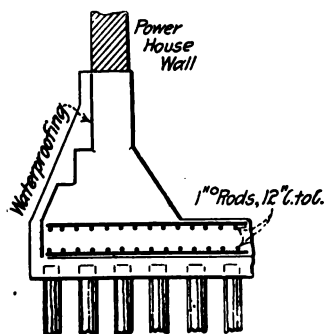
Capped Pile Foundation, Yonkers Power House,
